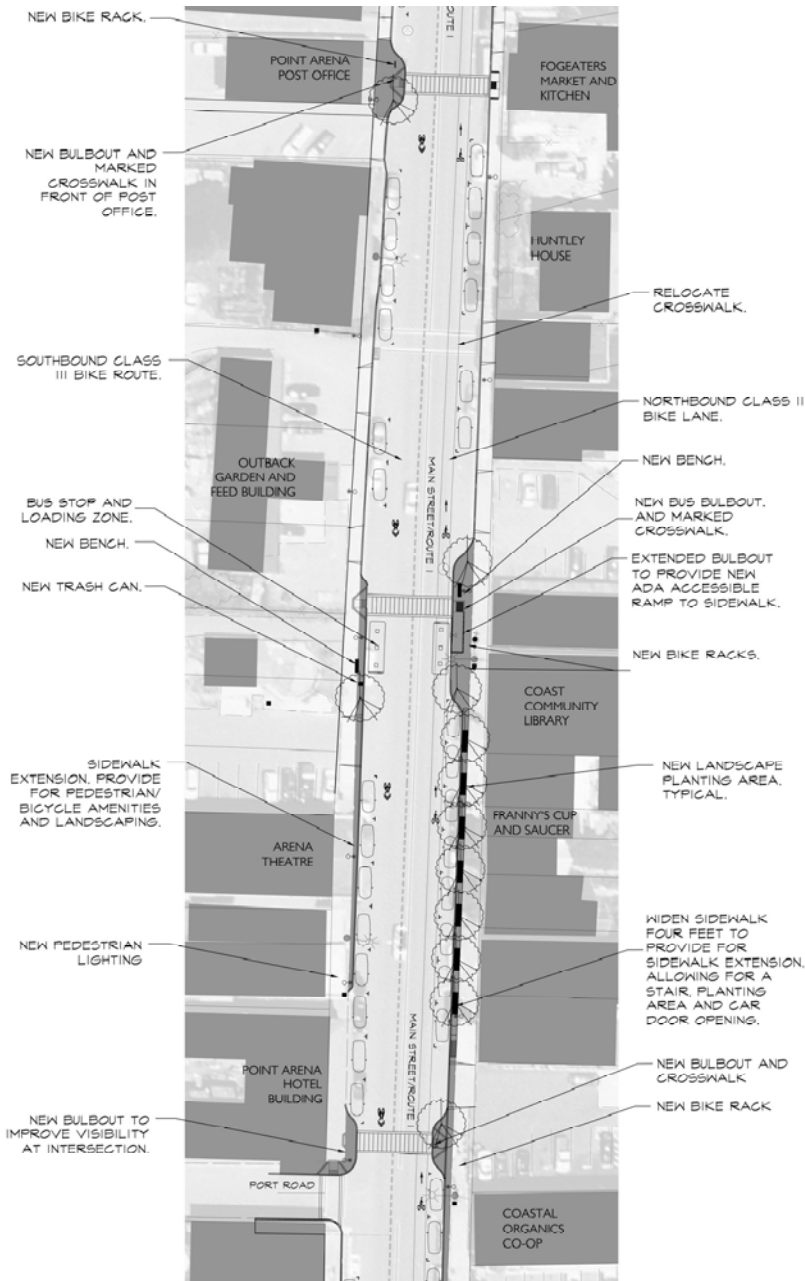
Proposed Pedestrian Improvements on Central Main Street
